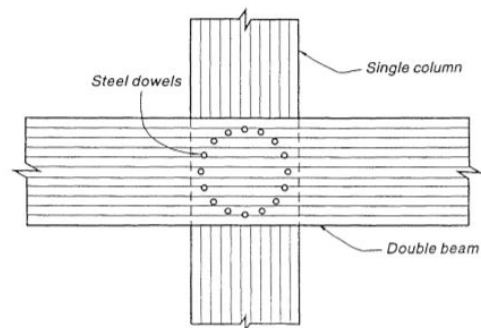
Dowel beam-column connection for multi-storey building (Buchanan and Fairweather, 1993).
